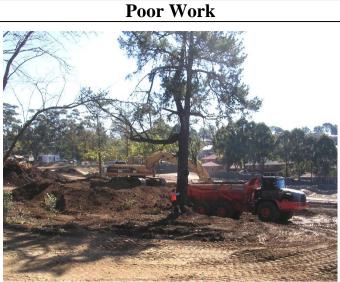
A single movement of a truck can cause significant damage to the absorbing roots.
